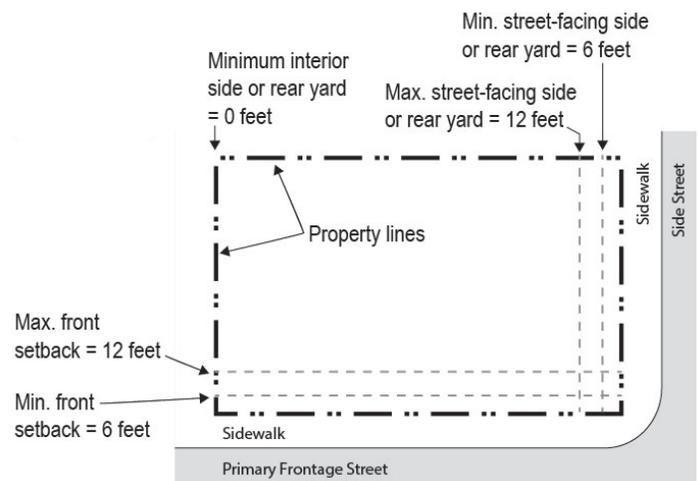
RC-BC Setbacks - with ground-floor residential
